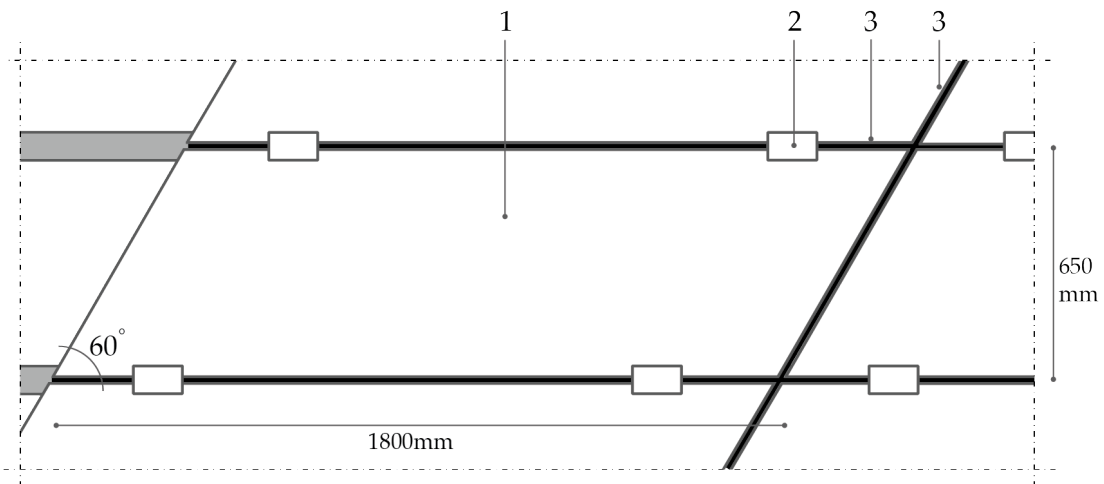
Fixing of the glass panels in top view [scale 1:20]
